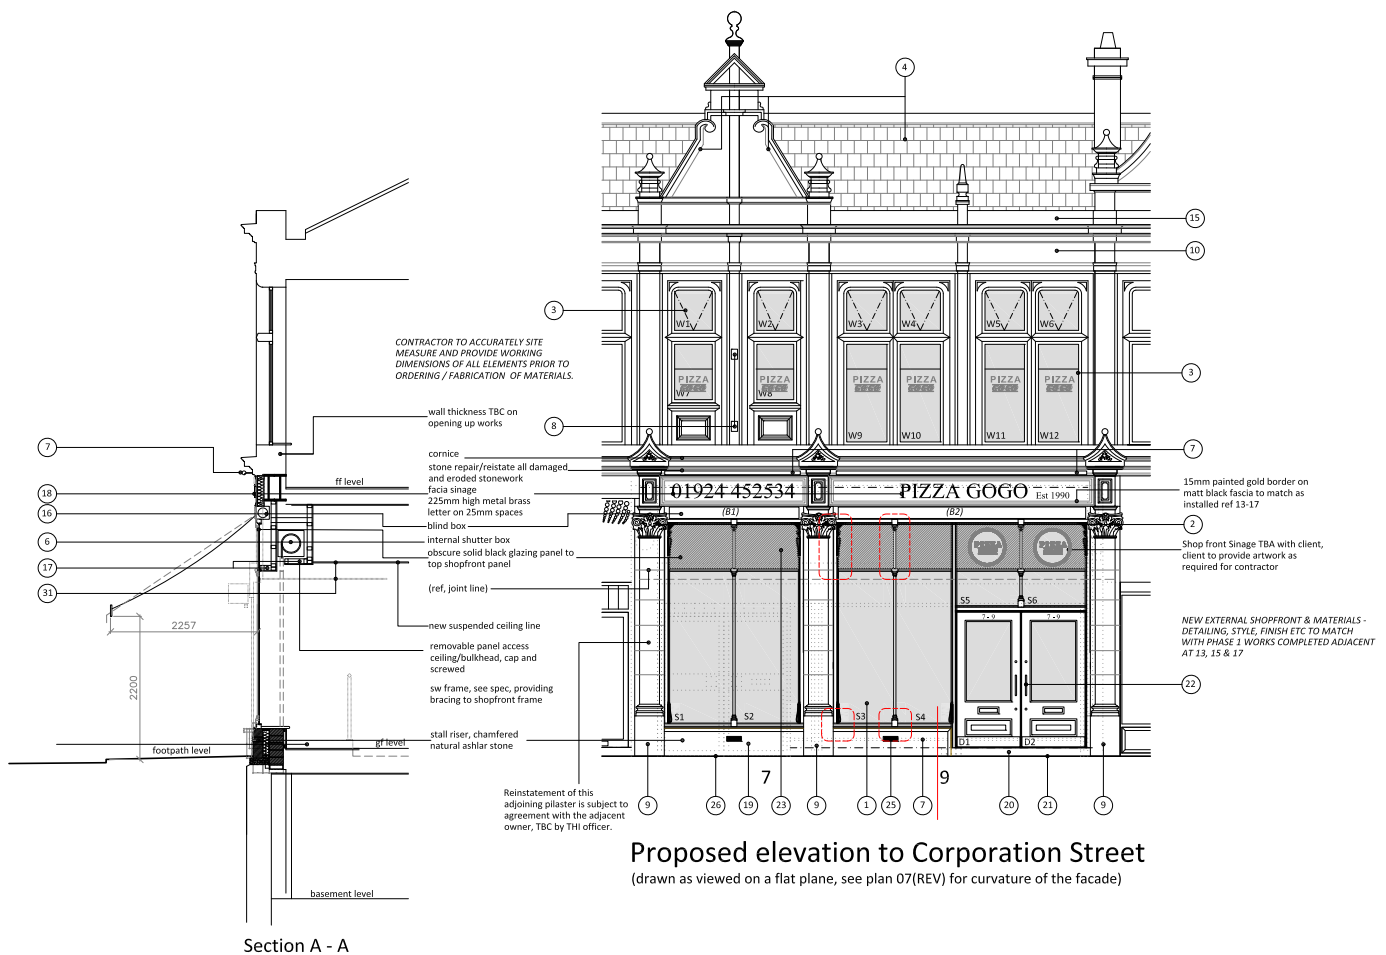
Extract from application drawing number 16.2145.05(rev) proposed elevation to Corporation Street
